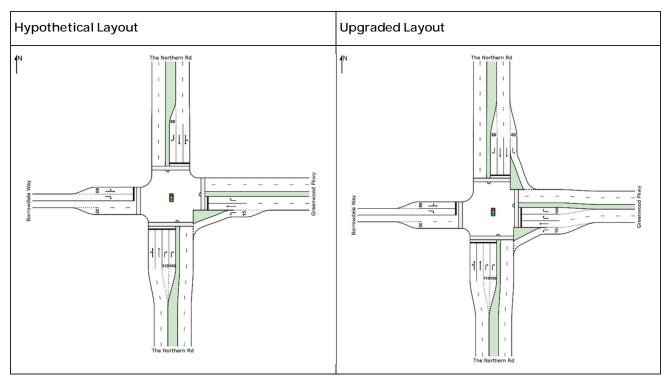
2026 with Links Road extension - The Northern Road/Borrowdale Way/Greenwood Parkway
